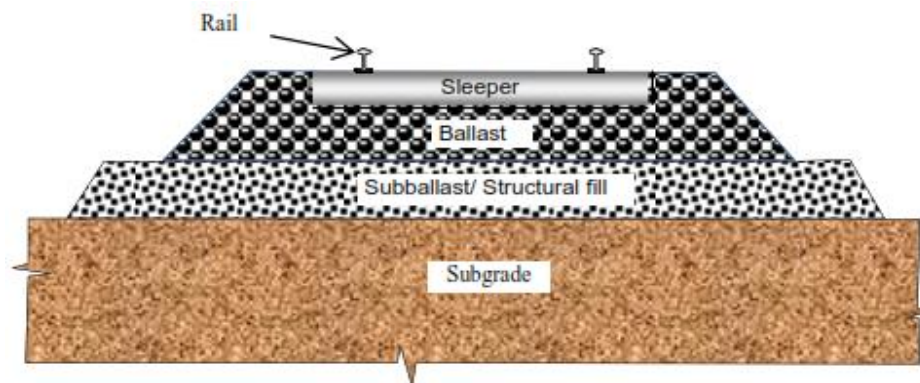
Typical Ballasted Railway Track Cross Section, [1].
